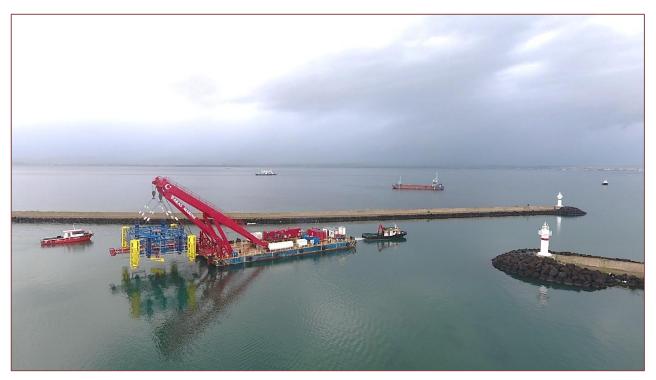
MUM departs from Lapseki Port to the working location of the 1915 Çanakkale Bridge
